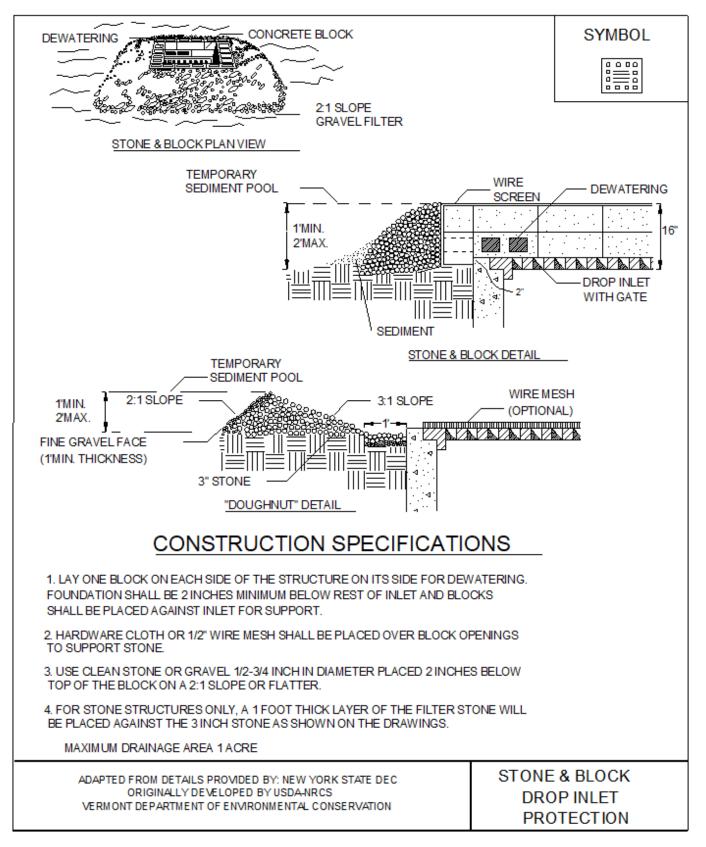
Storm Drain Inlet Protection: Stone & Block
